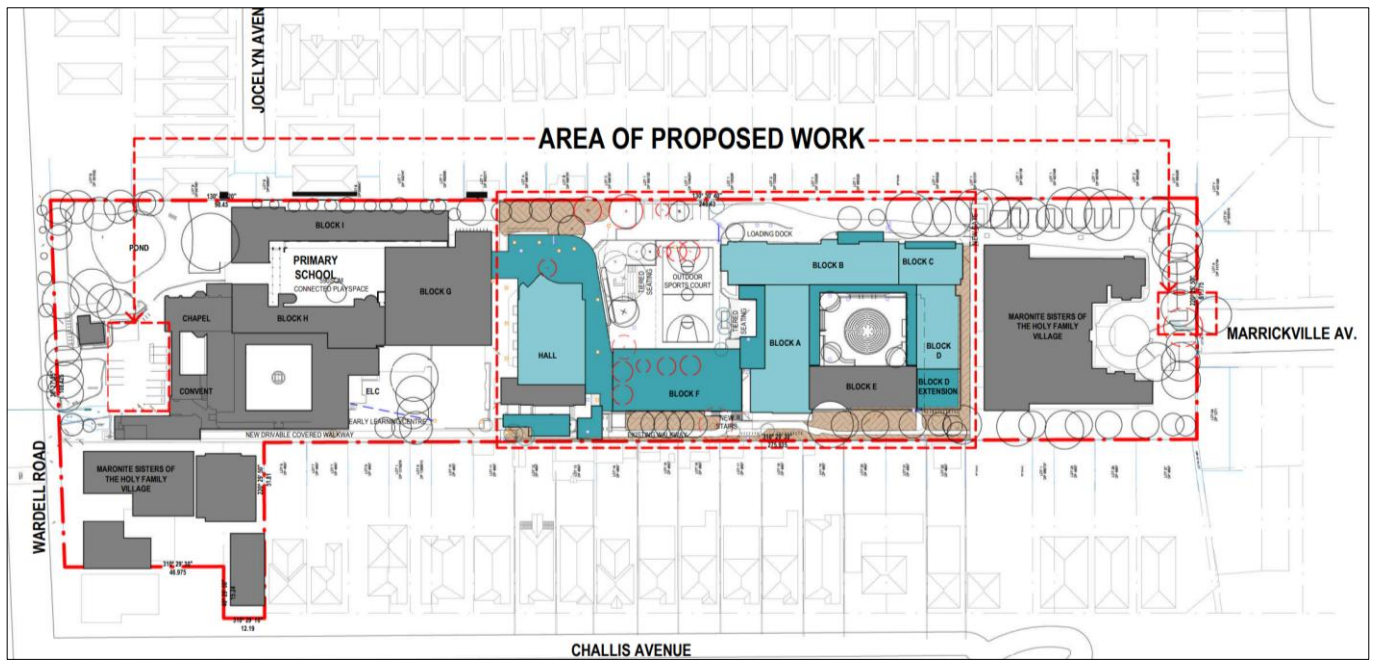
| Approved Site Plan for St Maroun's College (DA2022/0318) (Source: Leaf Architecture)
